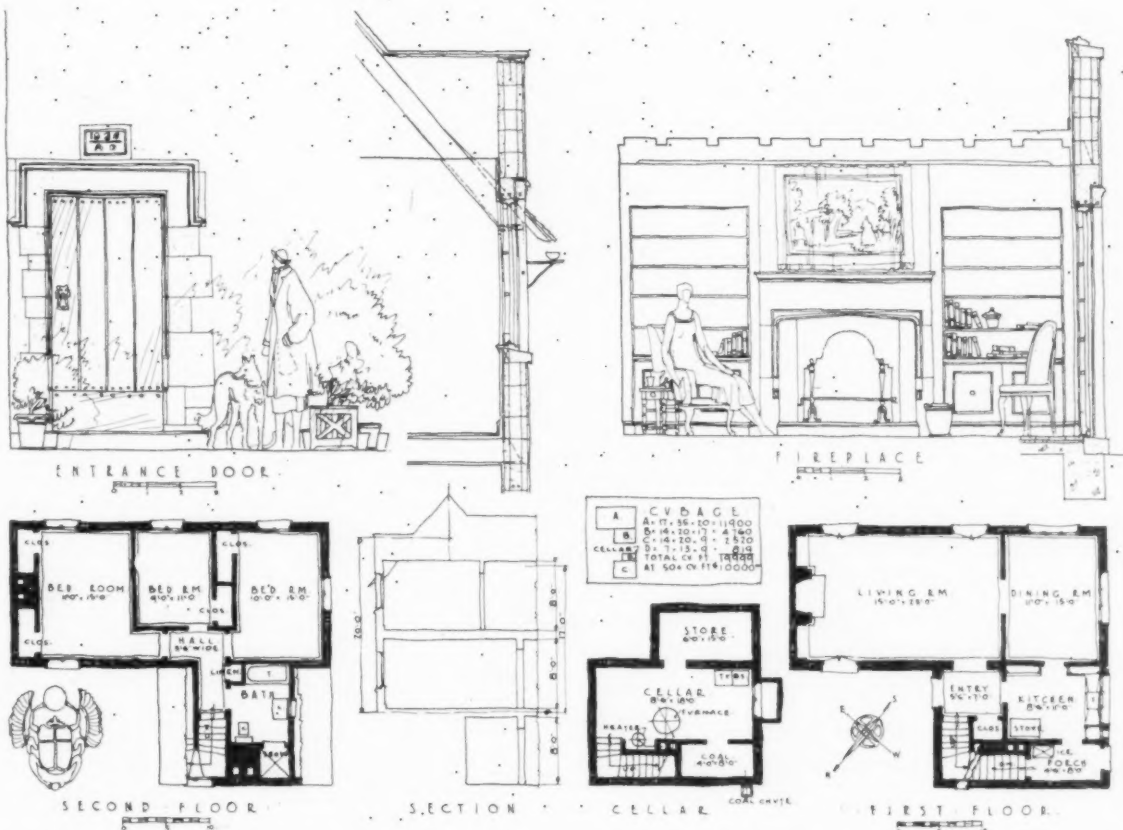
B, G. Dewey Swan, c/o H. T. Lindeberg, 2 West 47th Street, New York.
